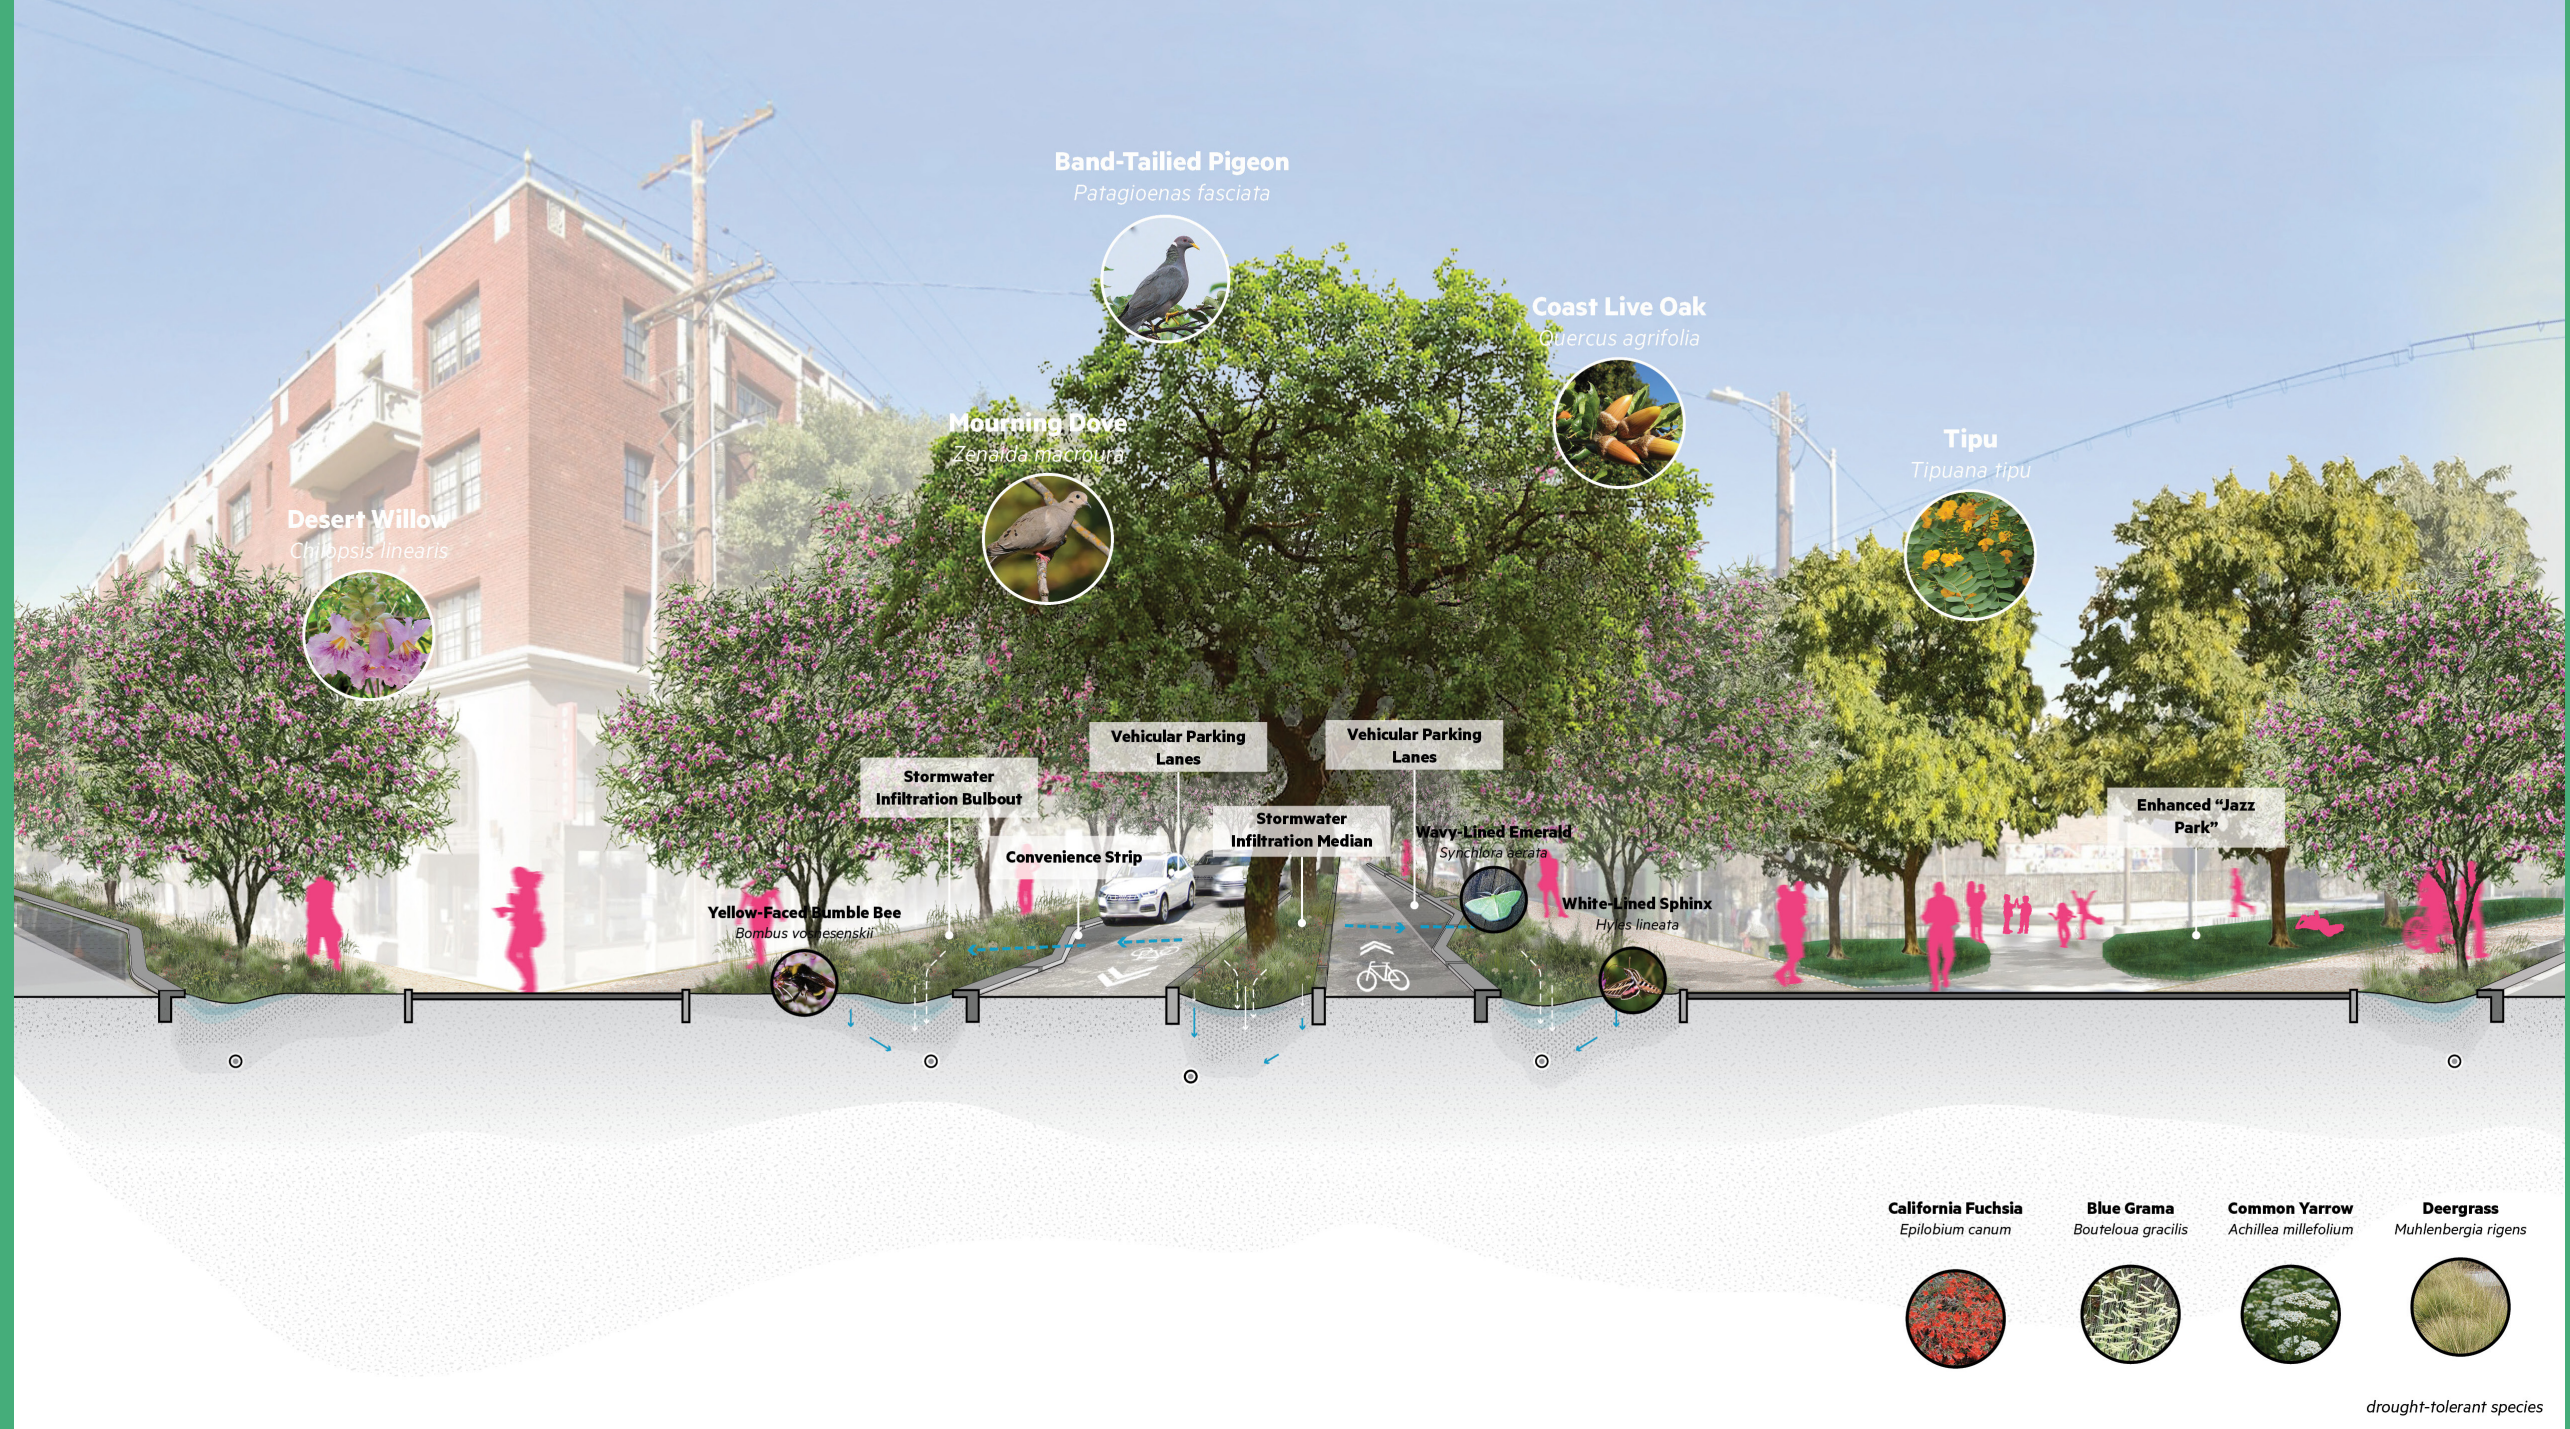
Central Avenue and 42nd Place, proposed design, Tier 3
